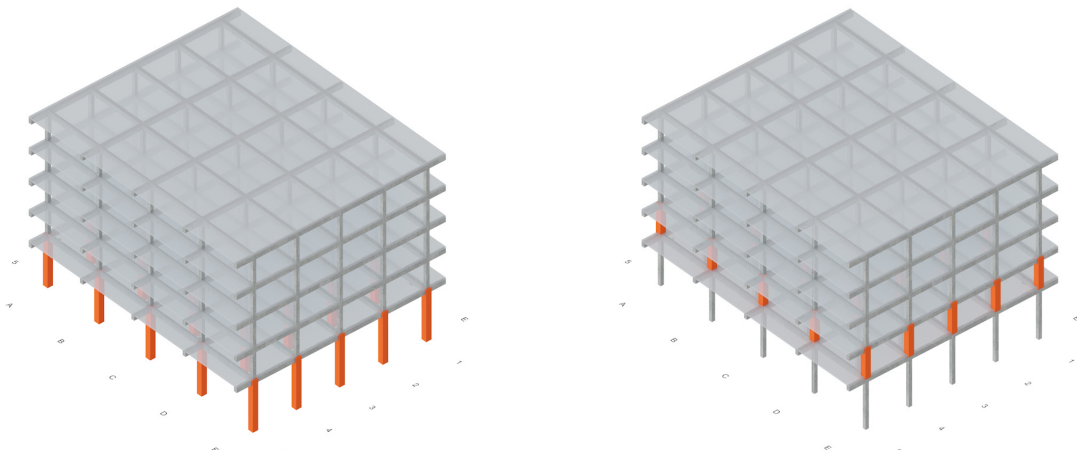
Column jacketing applied to all ground floor columns only (left image) and to all first-floor columns only (right) (author's own work)
